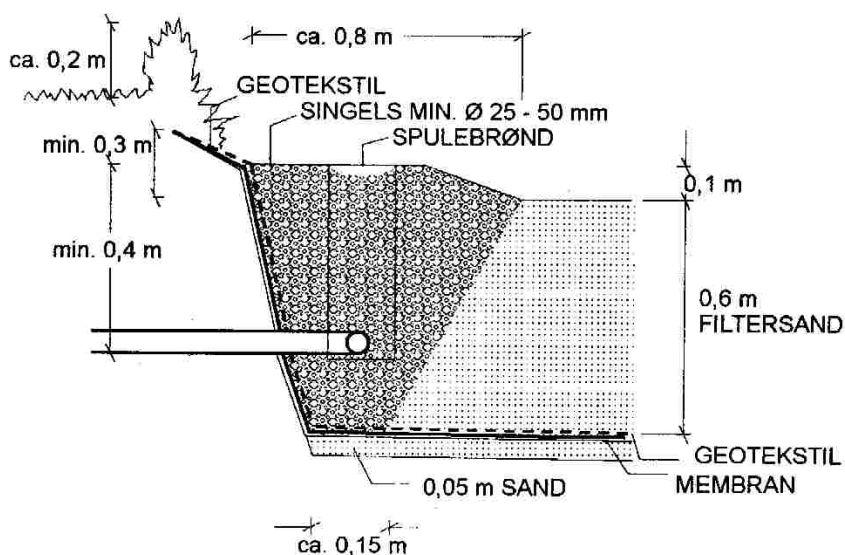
Cross section through the inlet arrangement of a root-zone system
